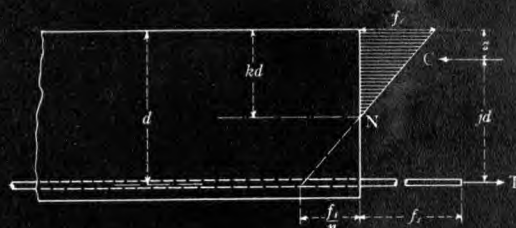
Nomenclature for Concrete Beam Reinforced for Tension.
